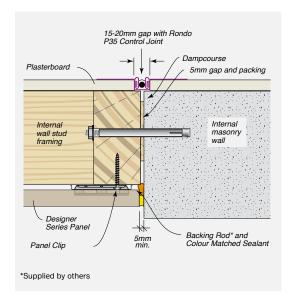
Typical Junction with Deep Masonry Wall – Plan View
